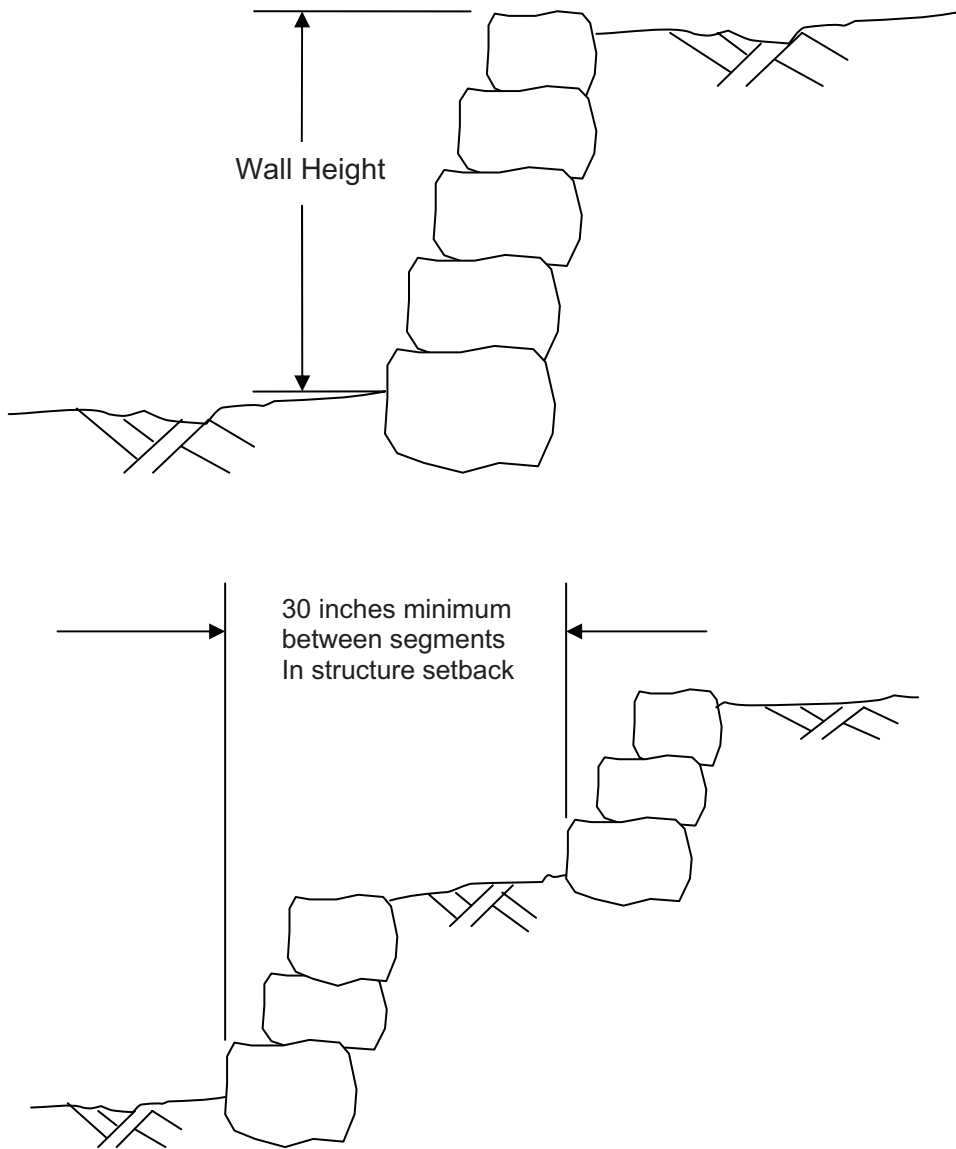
Rockery or Modular Wall Height Measurement for Structure Setback Requirements
